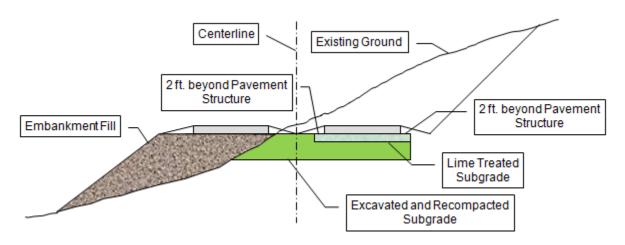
Cross Section of Lime Treated Cut Section Subgrade
